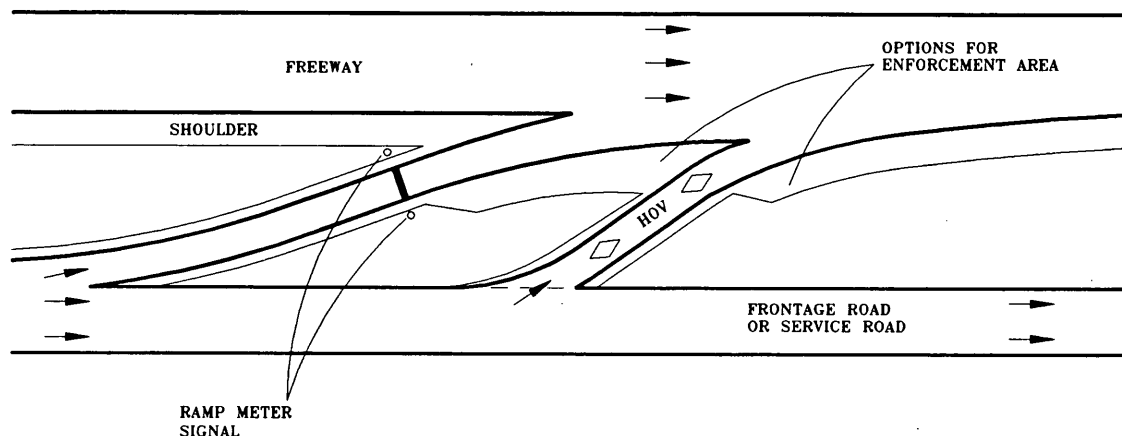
Separate HOV bypass lane at metered entrance ramp (12).
